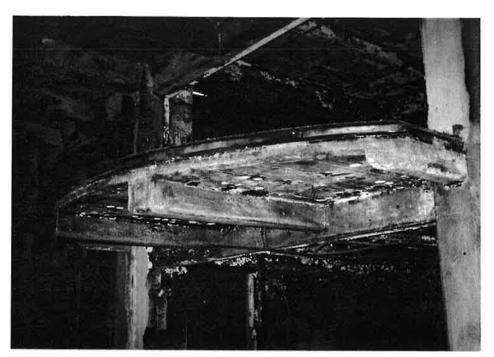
and 34: First-floor interior elevator shafts, 1998.
